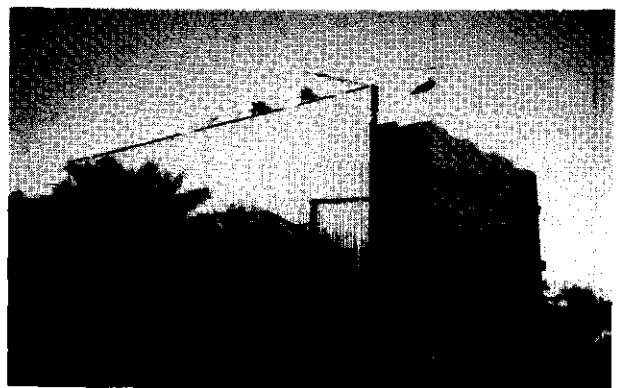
Additional screen on top of garden wall to block views from multi-storey building to courtyard house. Khobar, Saudi Arabia.
